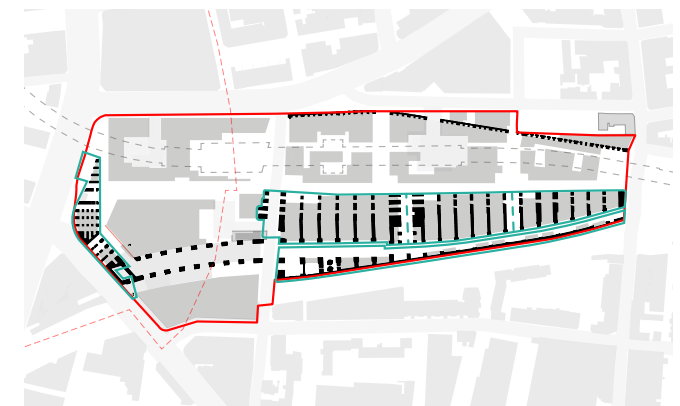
Key Plan: Ground level - the Braithwaite Viaduct
